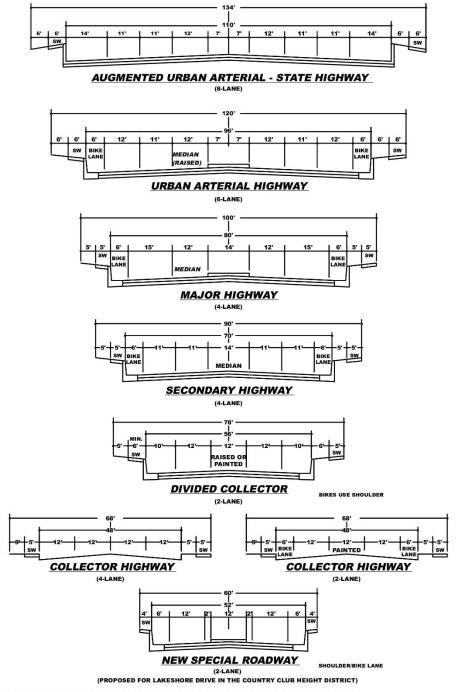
CITY OF LAKE ELSINORE GENERAL PLAN ROADWAY CROSS-SECTIONS
